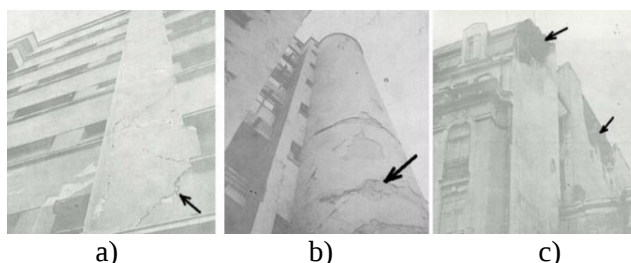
a) cracks inclined at 45° in the facade walls; b) dislocations of the plaster;
